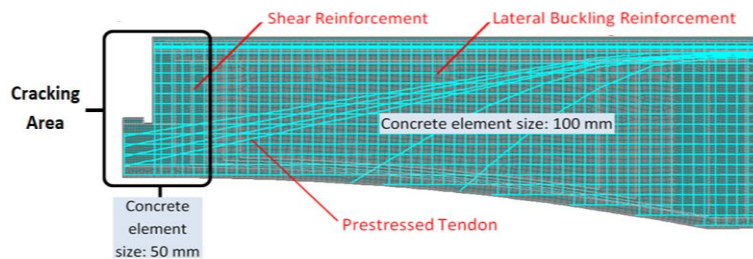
Detail of discrete reinforcement in analytical model and element size of concrete.
